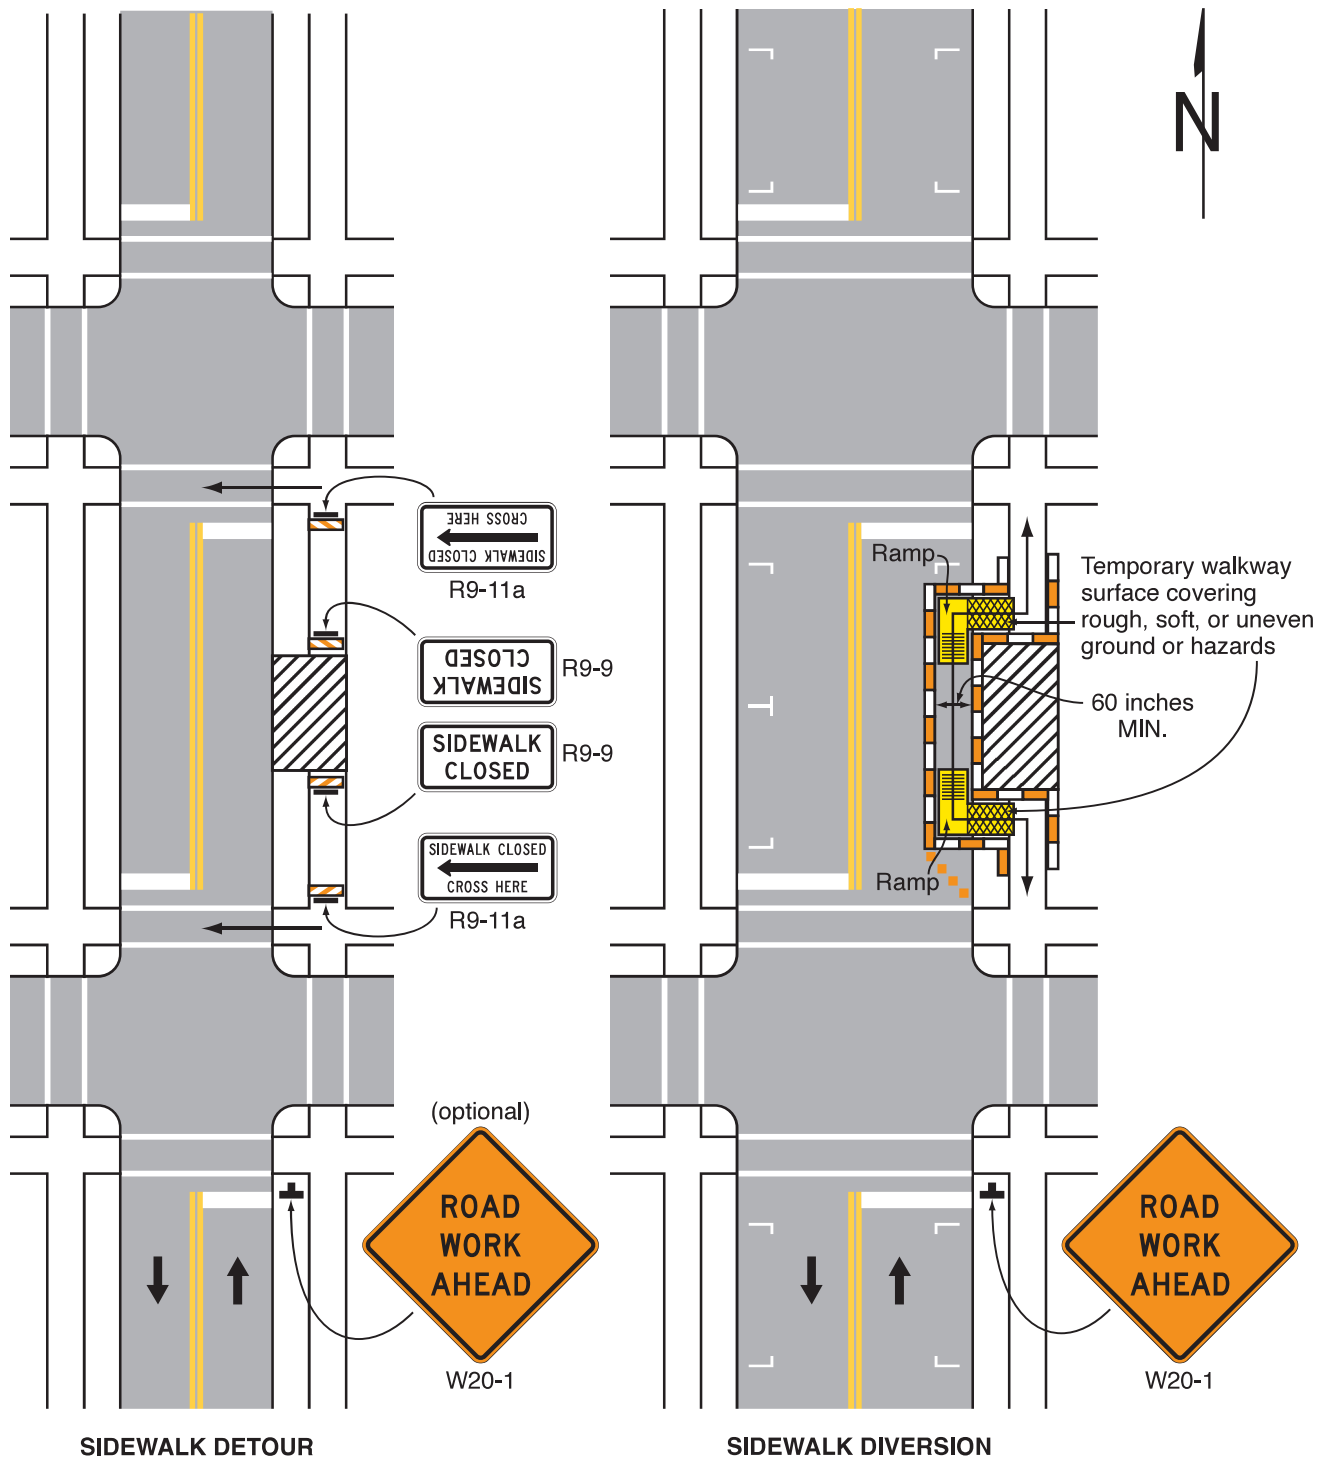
P-28. Sidewalk Detour or Diversion (TA-28)Typical Application 28
